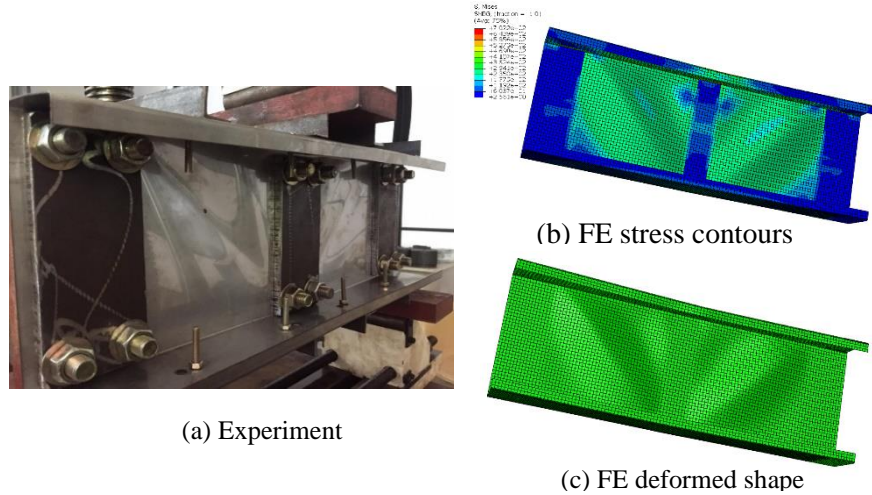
Shear failure mode of LCB 200×75×15×1.2 section
